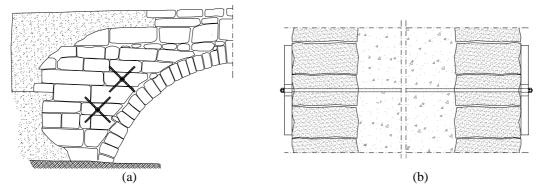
Strengthening of the spandrel walls: (a) anchor cross-shape plates; (b) transversal elevation view.
